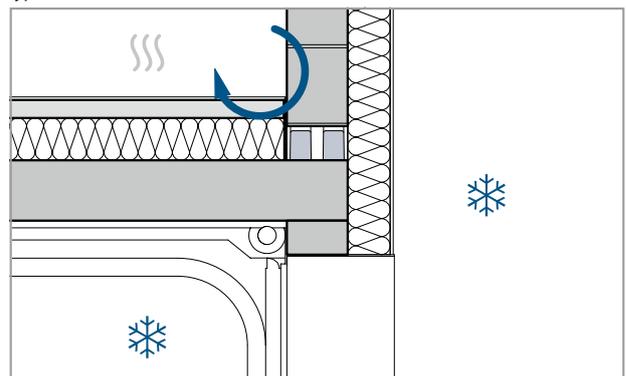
Pos. ①: Heat flow with underground garage wall with Schöck Sconnex® type M
